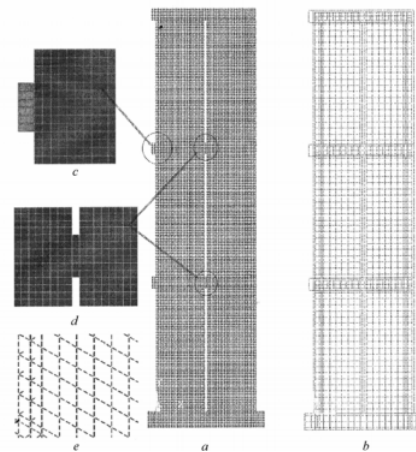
Finite element model: a – concrete Solid 65, b – reinforcement Link 8, c – detail of loading zone, d – details of connections, e – 3-D detail of reinforcement arrangement (BÄETU S and CIONGRADI I.P, 2011).
